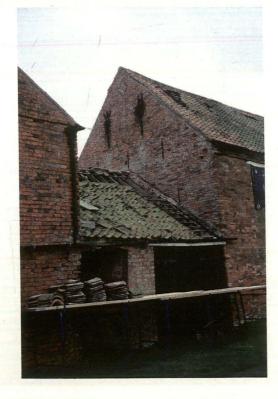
single storey covered passageway and garage, north elevation, and east elevation of main barn with initials 'W H' formed by stay plates, looking southwest
